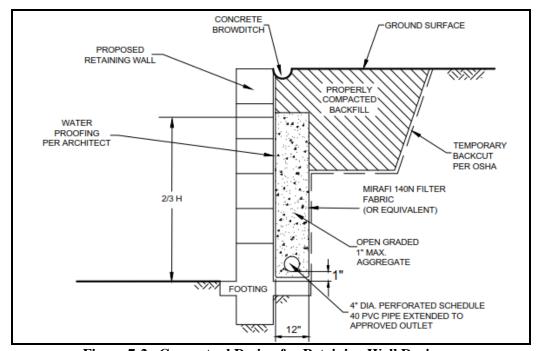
Conceptual Design for Retaining Wall Drainage
